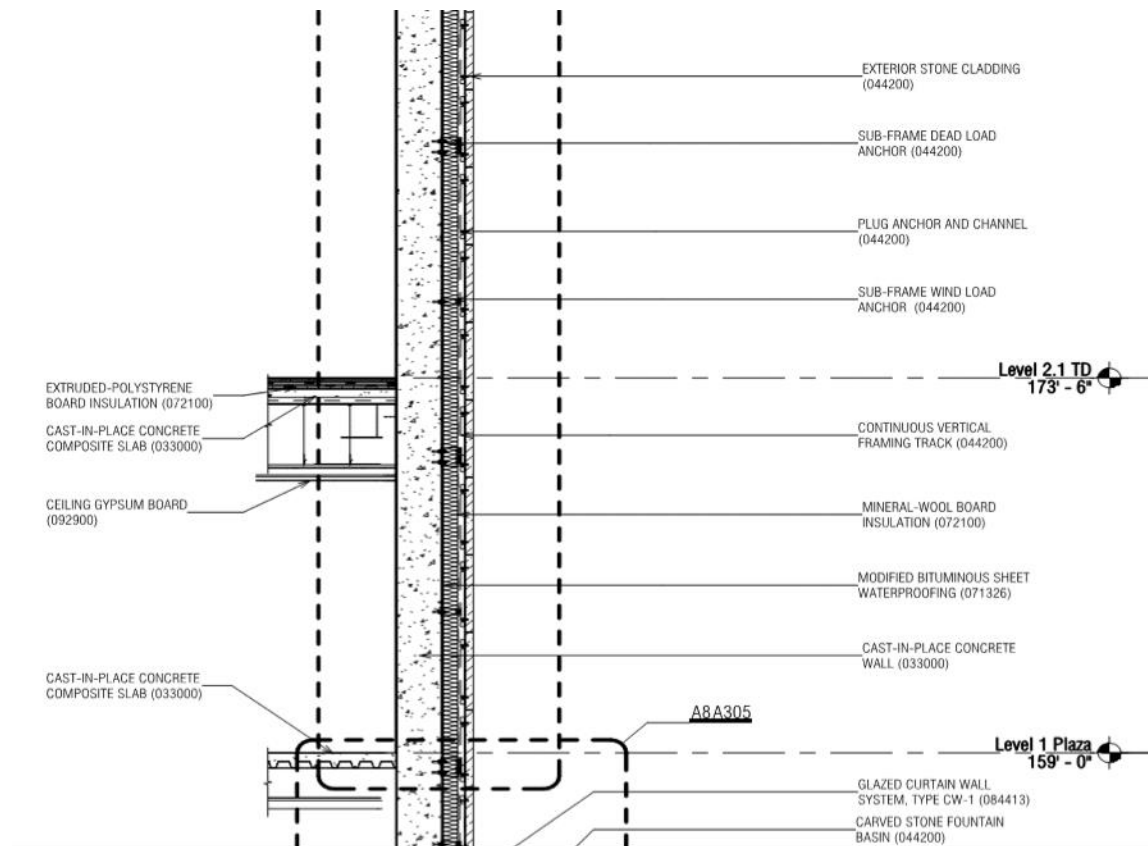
Exterior wall section illustrating connection and support of Lecce Limestone Paneling
